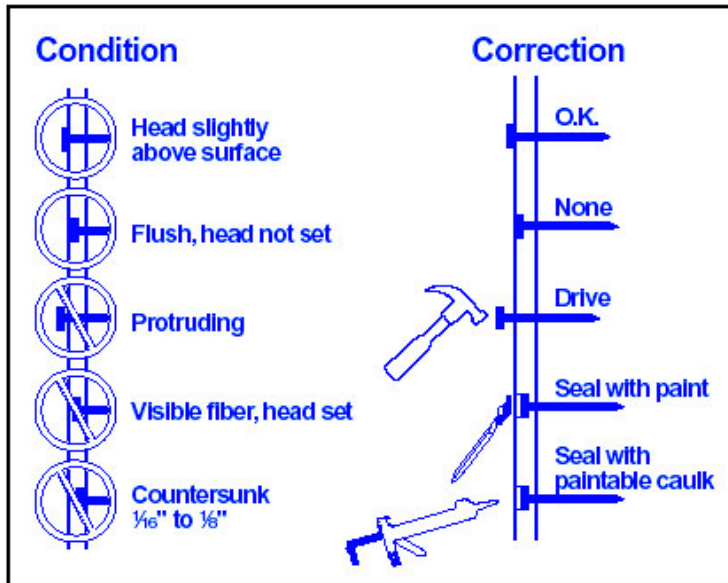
COMMONLY ENCOUNTERED CONDITIONS AT FACE NAILS AND THE RECOMMENDED REPAIRS
